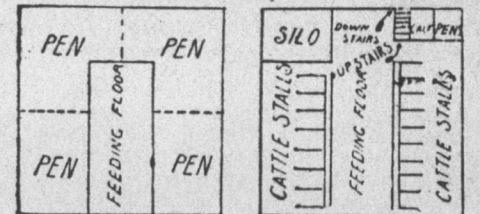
FLOOR PLAN FOR SHEEP BARN.
